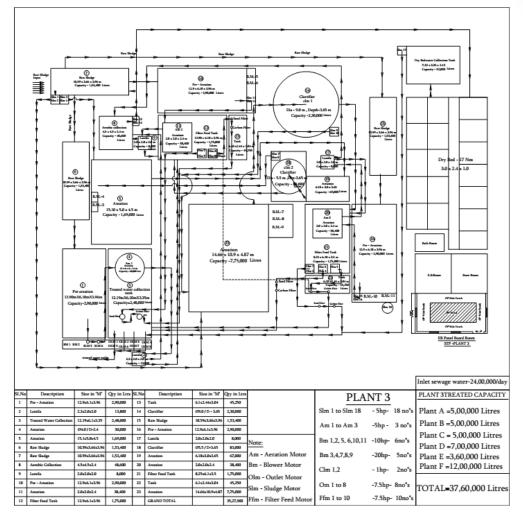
layout of the Waste Water Treatment facility at SRMIST–Plant 3
